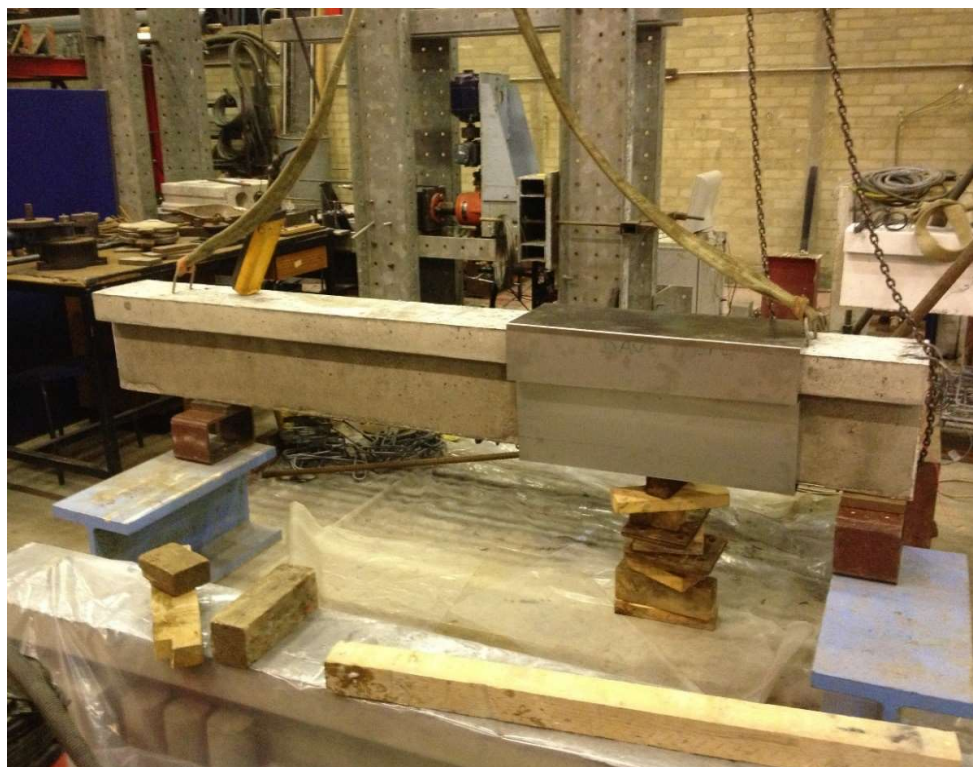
Stainless steel sheet secured on the targeted location
